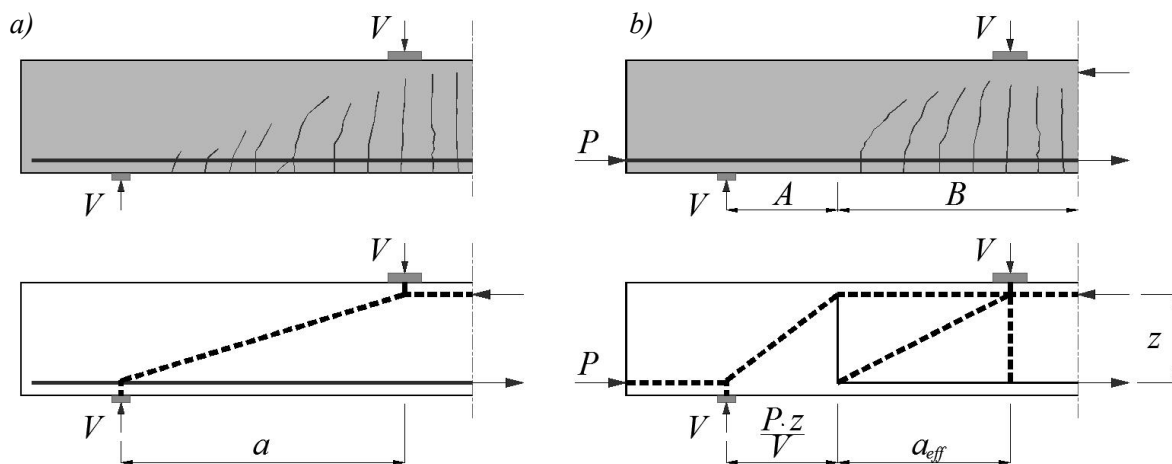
Geometric shear span in a reinforced concrete beam (a); effective shear span for a prestressed member (b) [FER2010]
